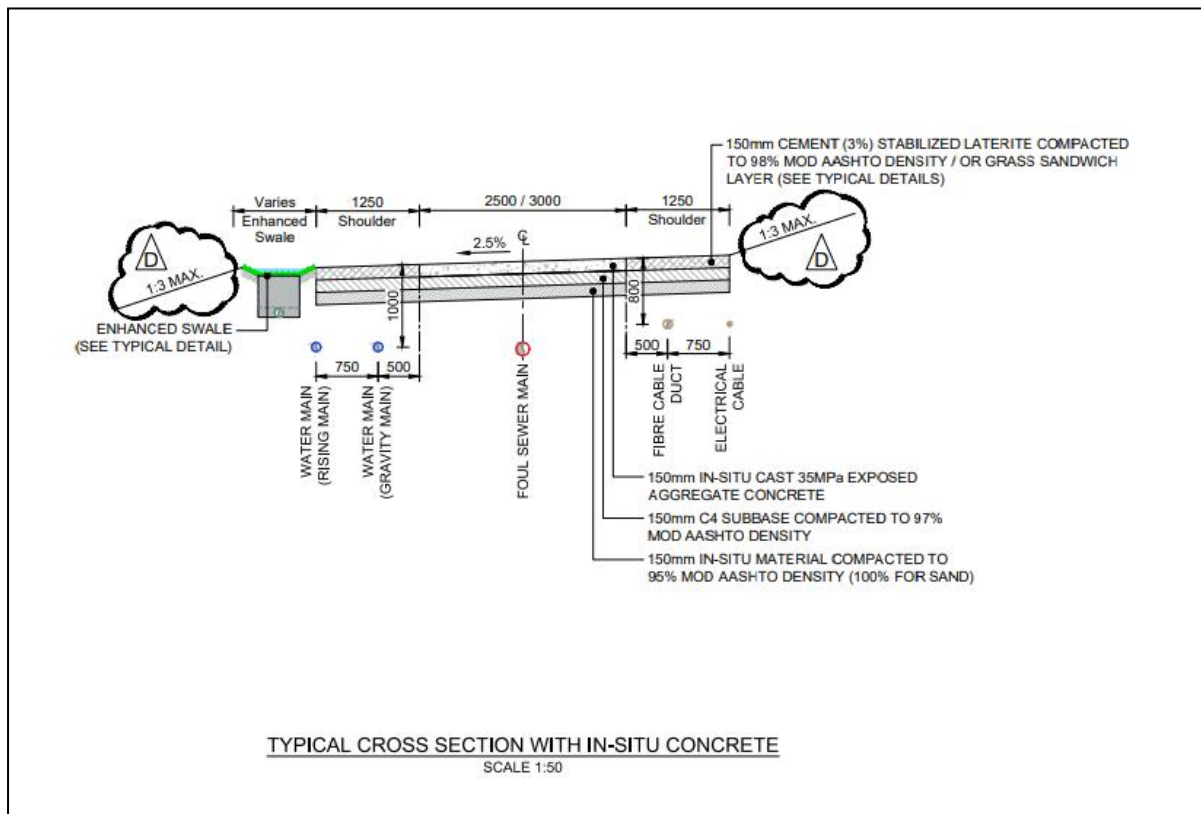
Typical Road Cross-Section with In-Situ Concrete
